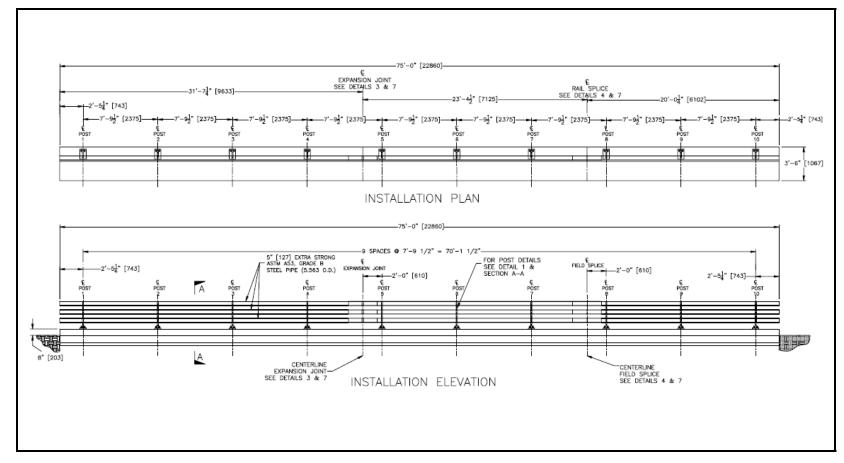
Layout of George Washington Memorial Parkway Bridge Rail
